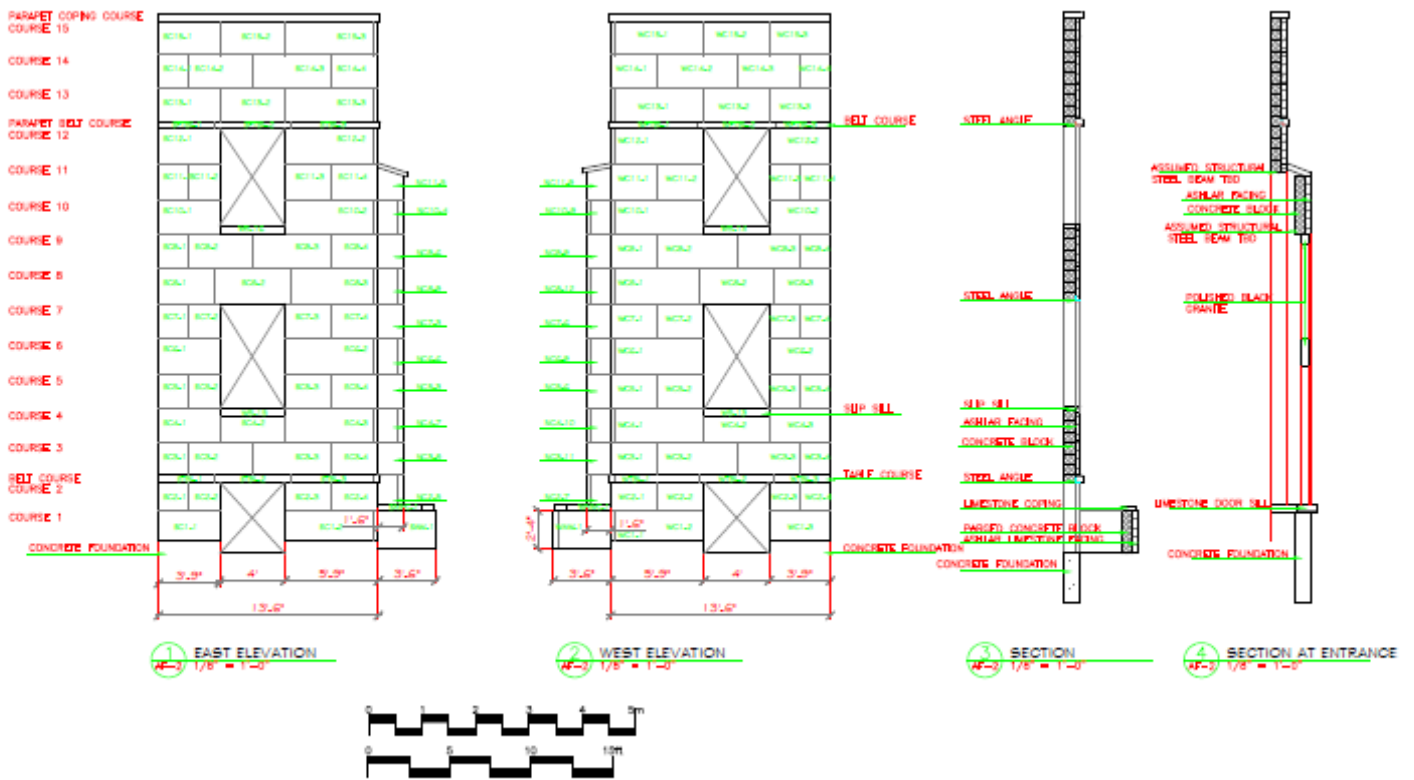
Side Elevations and Sections As-Found drawing AF2 credit: Commonwealth.
